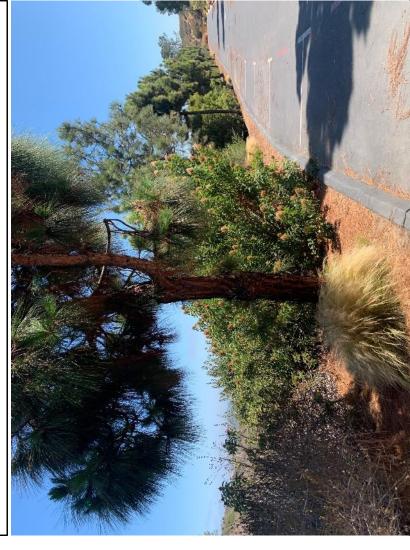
Photograph of existing driveway/parking lot along the western side of the Project site. Photograph taken facing north
